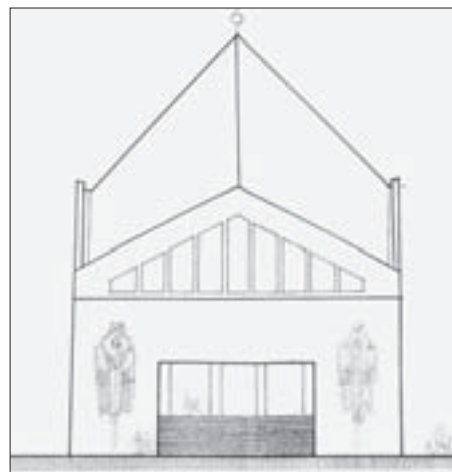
V. BALLEY: WEST FAÇADE, 1986
